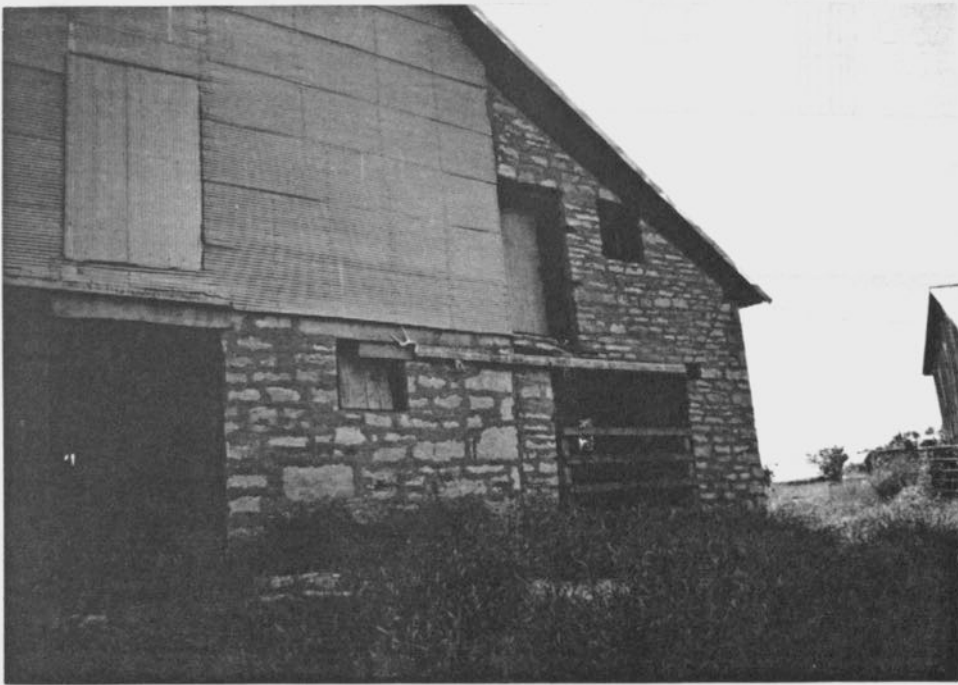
North elevation of barn showing livestock openings and aluminum-clad wood
